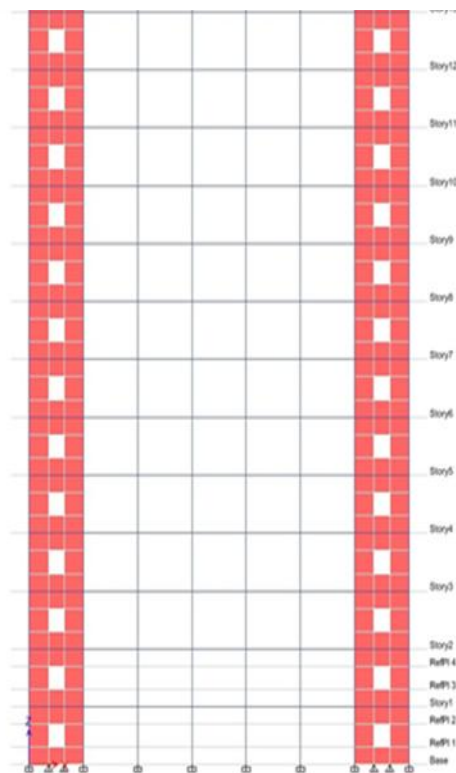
Elevation view showing centre window openings of size 1 m X 1.2 m
